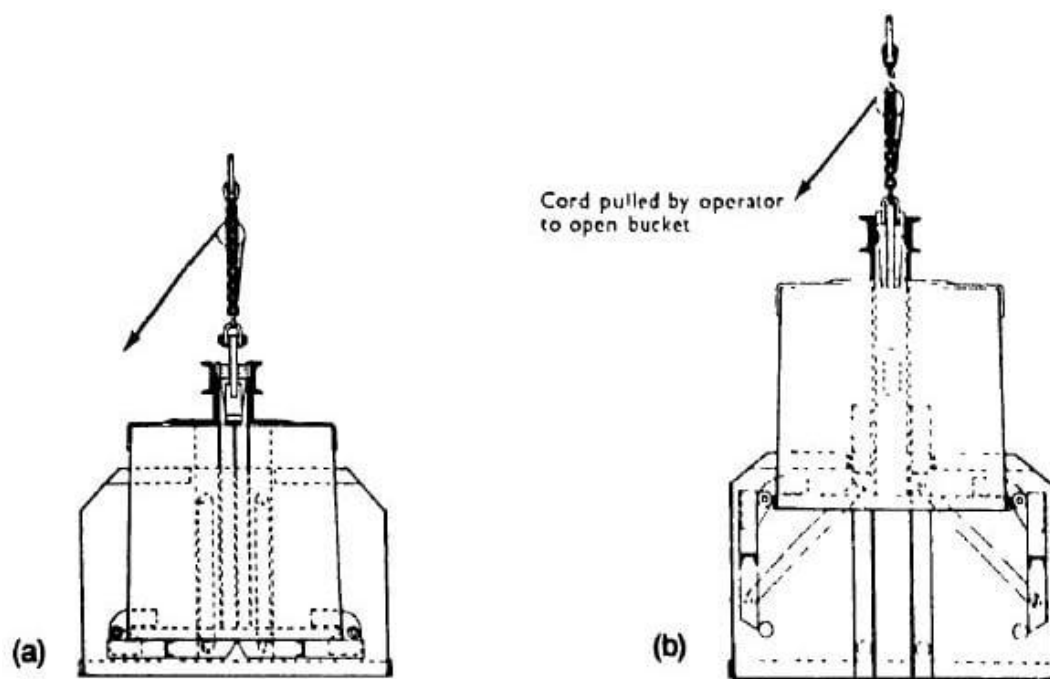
Skips for Underwater Concreting (a) Closed and (b) Opened
